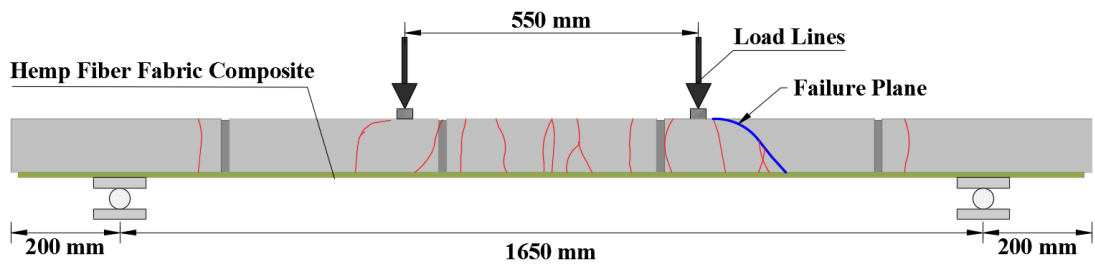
Schematic View of Series H3 Cracked Wall Specimen.
